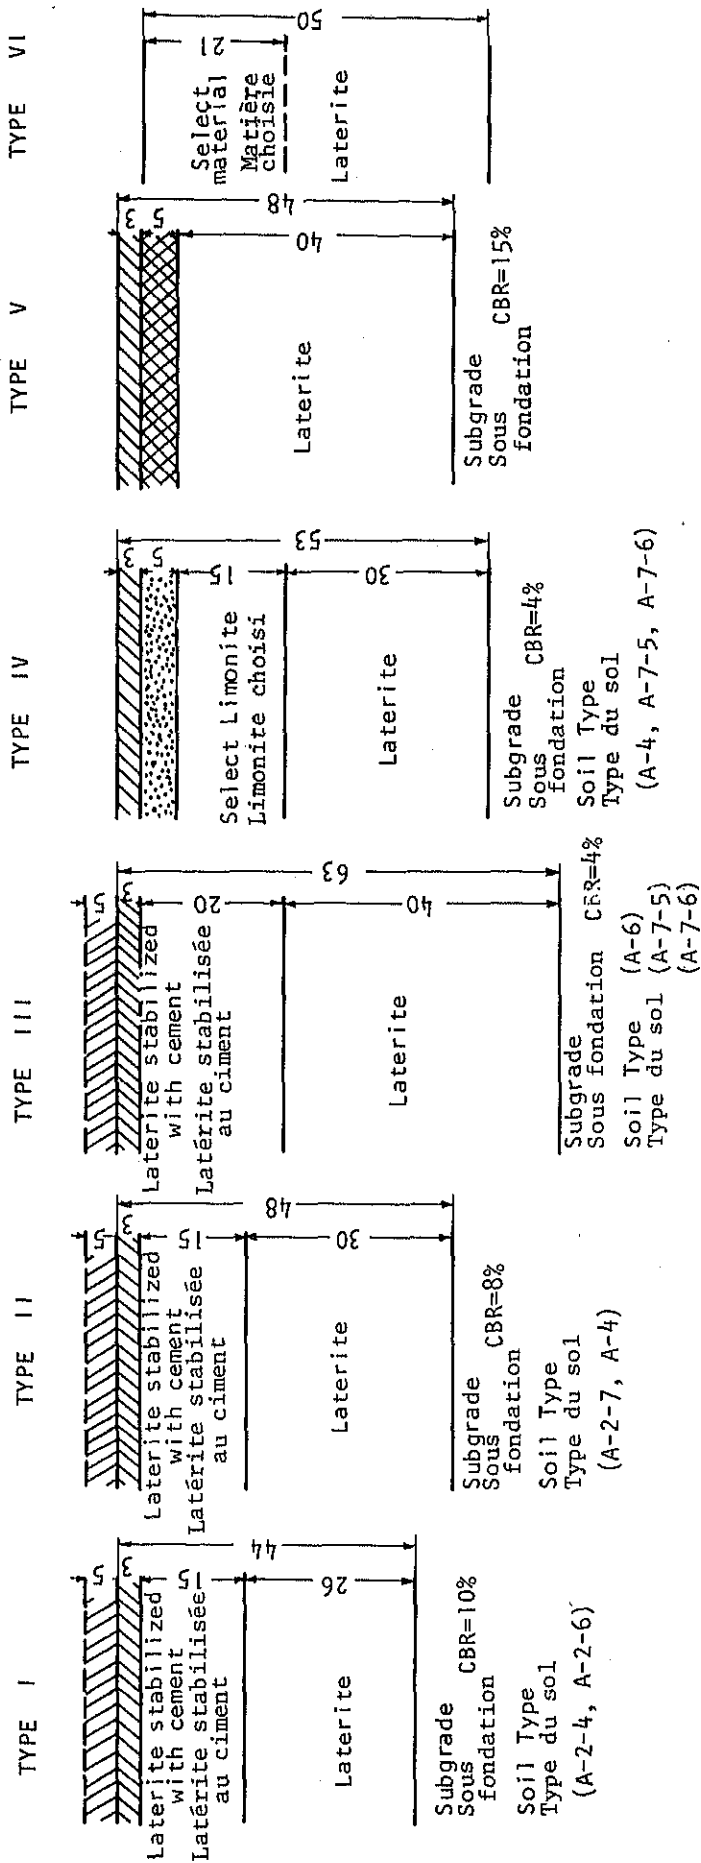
TYPICAL SECTIONS OF PAVEMENT
